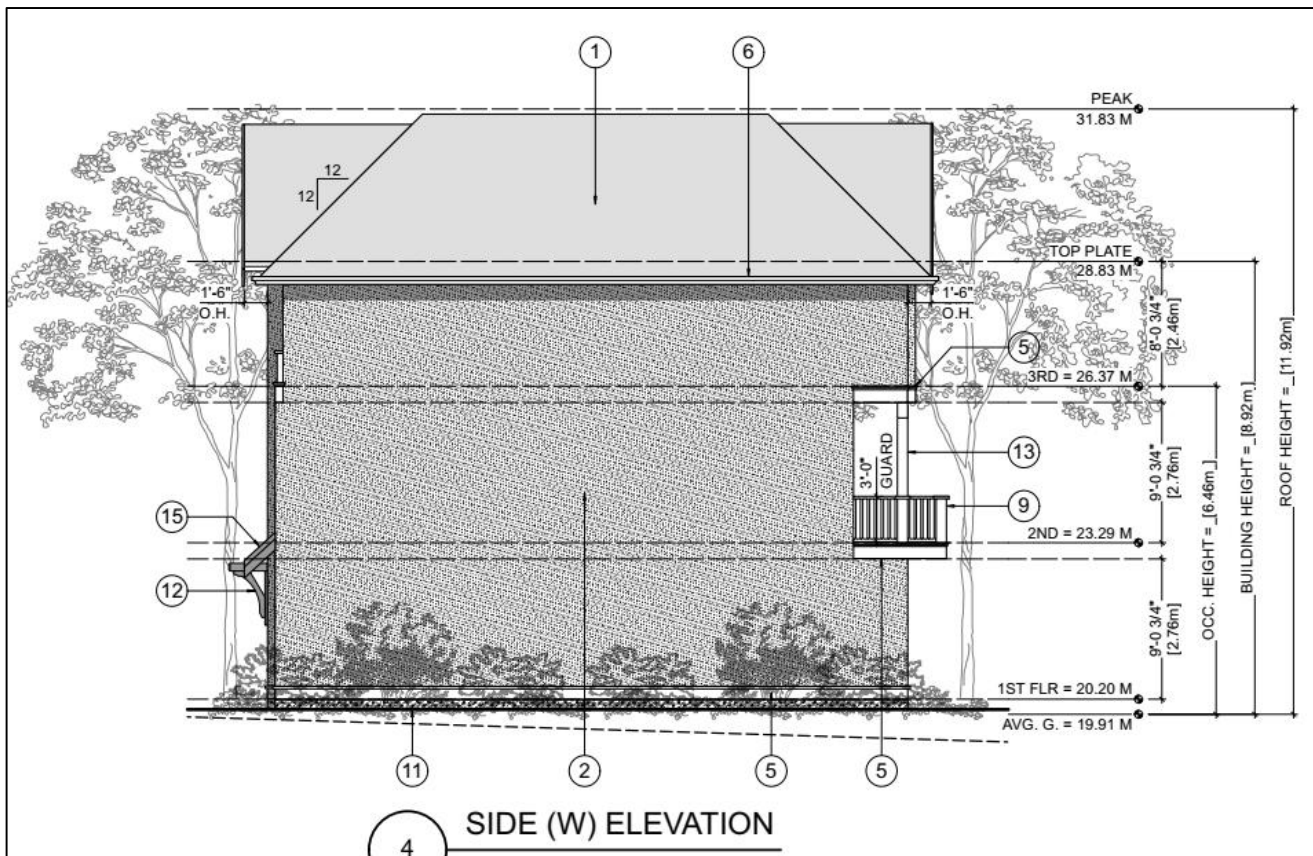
Snapshot from the preliminary building plans July 31st, 2025) showing the proposed “Building C” elevations. Not to scale.
